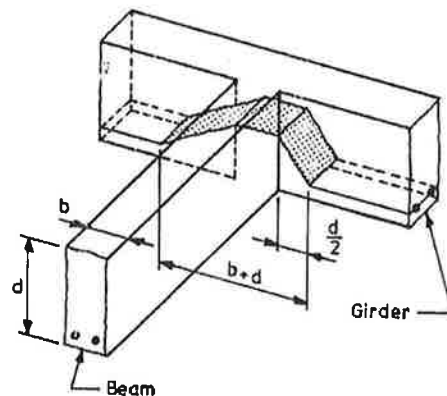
CRACKING AT POINT WHERE A BEAM IS SUPPORTED ON A GIRDER
